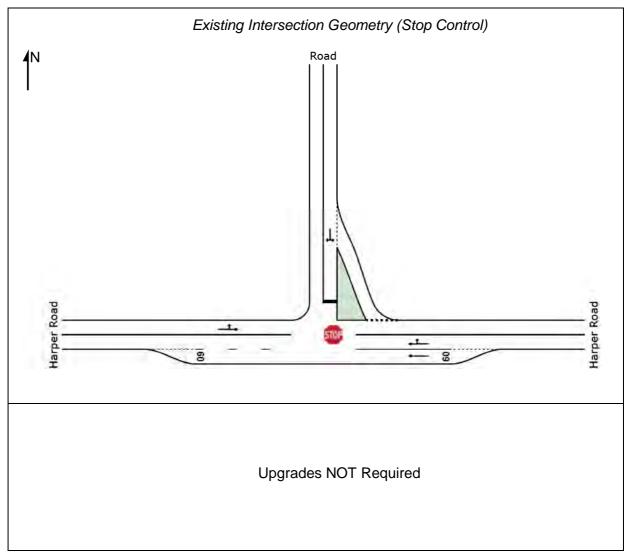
Geometry - Harper Road / Unnamed Road Intersection
